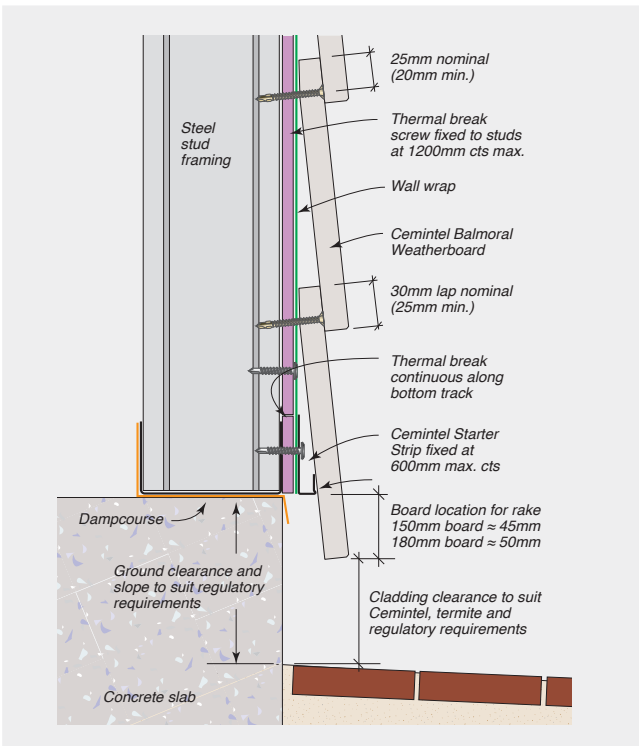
Typical Screw Fixing Direct to Steel Studs Over Thermal Break
